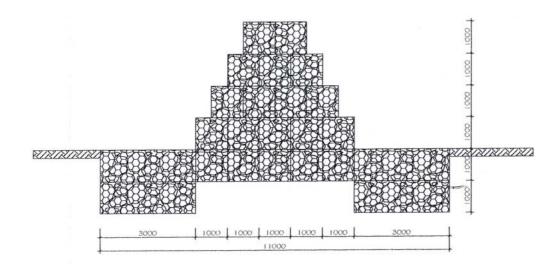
Cross section of a spur design in Chitwan showing substantial groundwork Illustration: Practical Action Nepal.
